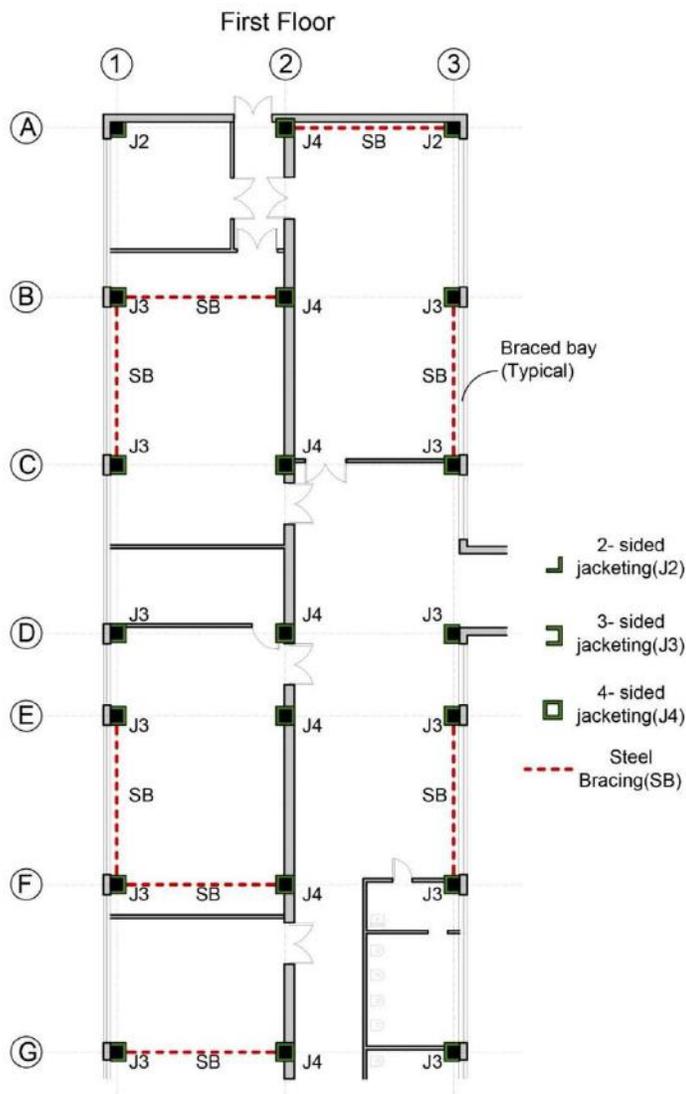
Floor plan of the retrofitted building for RS2: RC column jacketing and steel braces.
